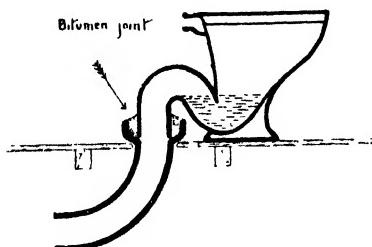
Showing method of connecting a pan to a drain pipe.
